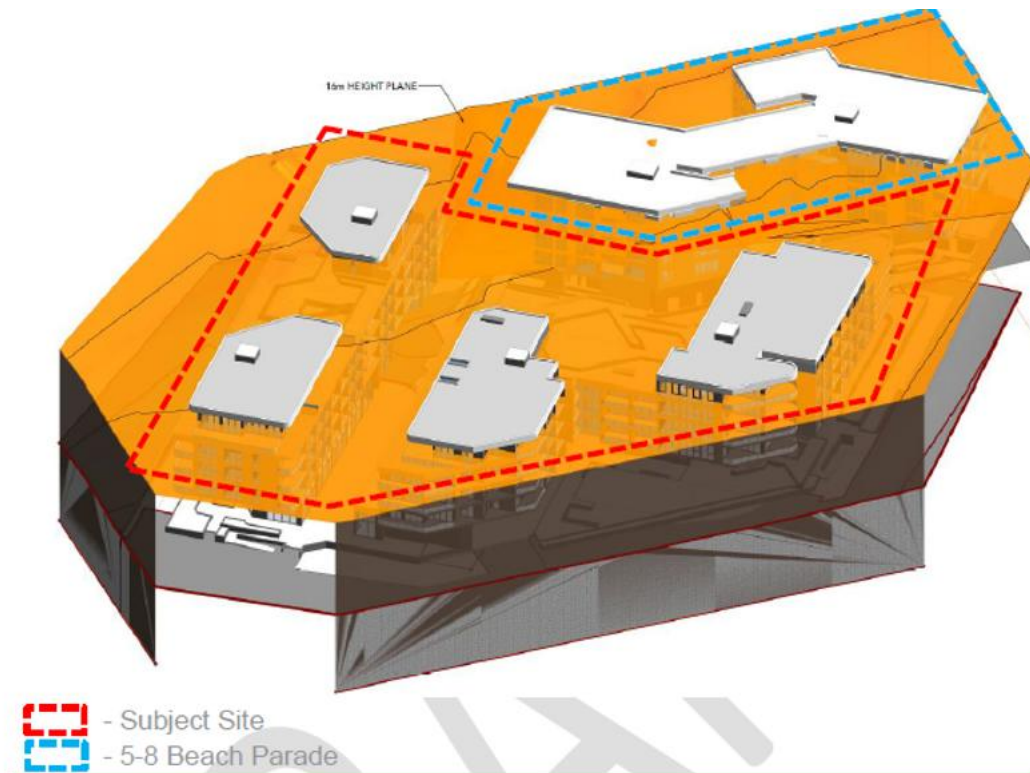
Team 2 Architects 3D Height Plane showing the subject site (Site 1 and Site 2) and Site O (5-8 Beach Parade) (Source: Think Planners)
